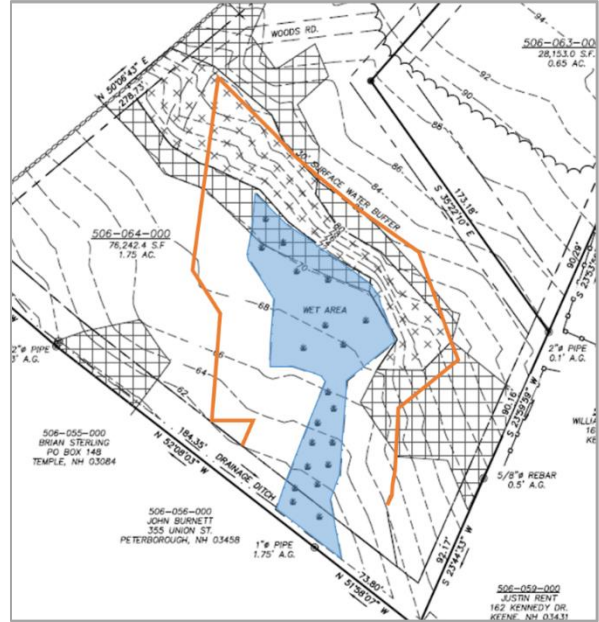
Image of a section of the proposed plan with the wetland area shaded in blue and the 30-foot Surface Water Protection buffer outlined in orange.
